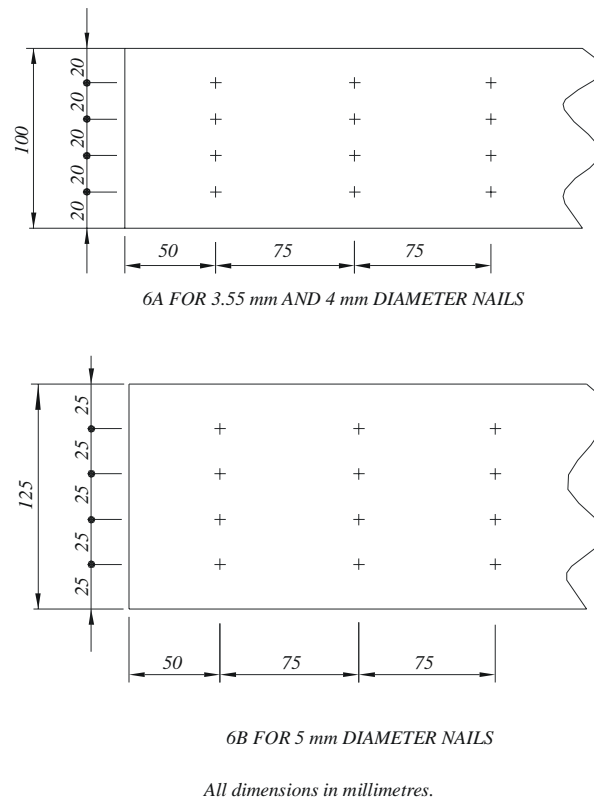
Standard Lengthwise Spacing in Nailed Laminated Beam
